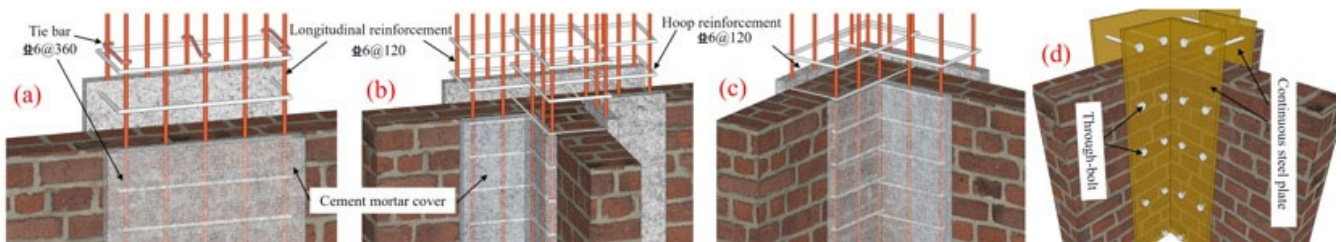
Construction diagram for installing tie columns in various wall configurations. (a) Straight wall. (b) Intersection of longitudinal and transverse walls. (c) Building corner. (d) Steel plate reinforcement at the junction of transverse and longitudinal walls.
